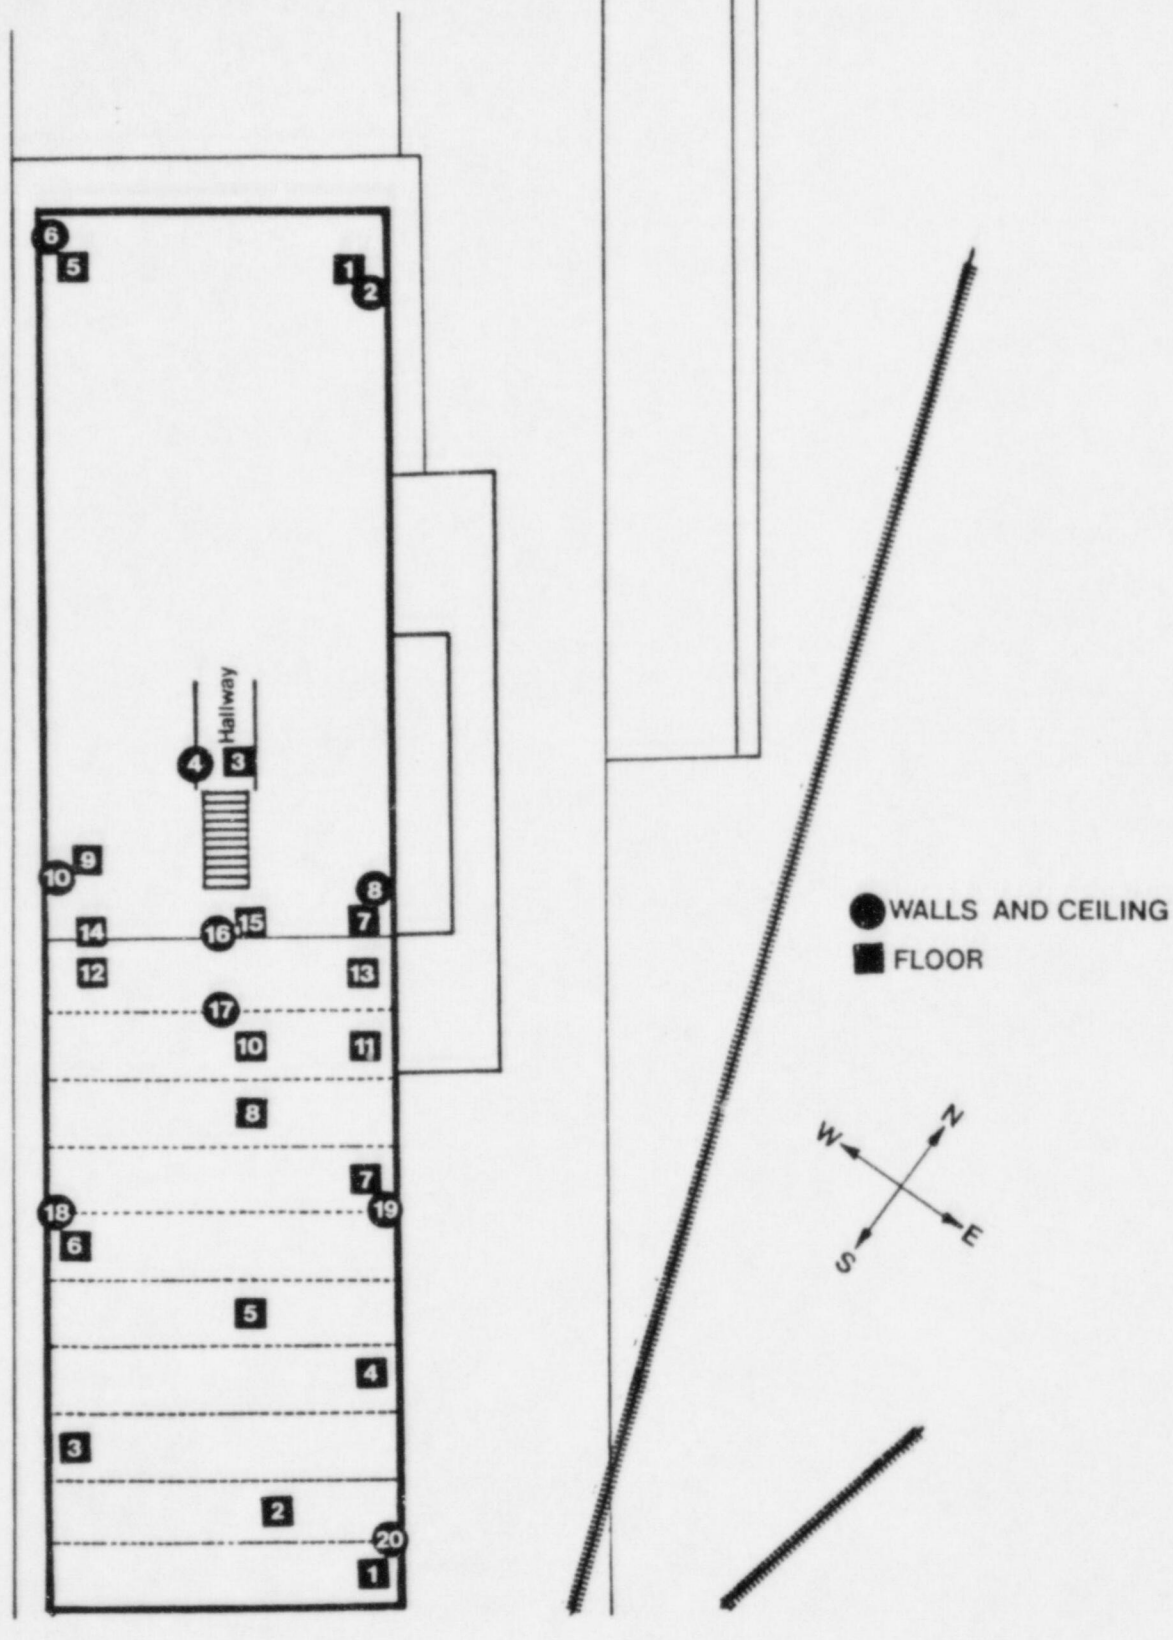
Floor Plan of Building No. 2 Indicating Locations of Measurements and Smears
